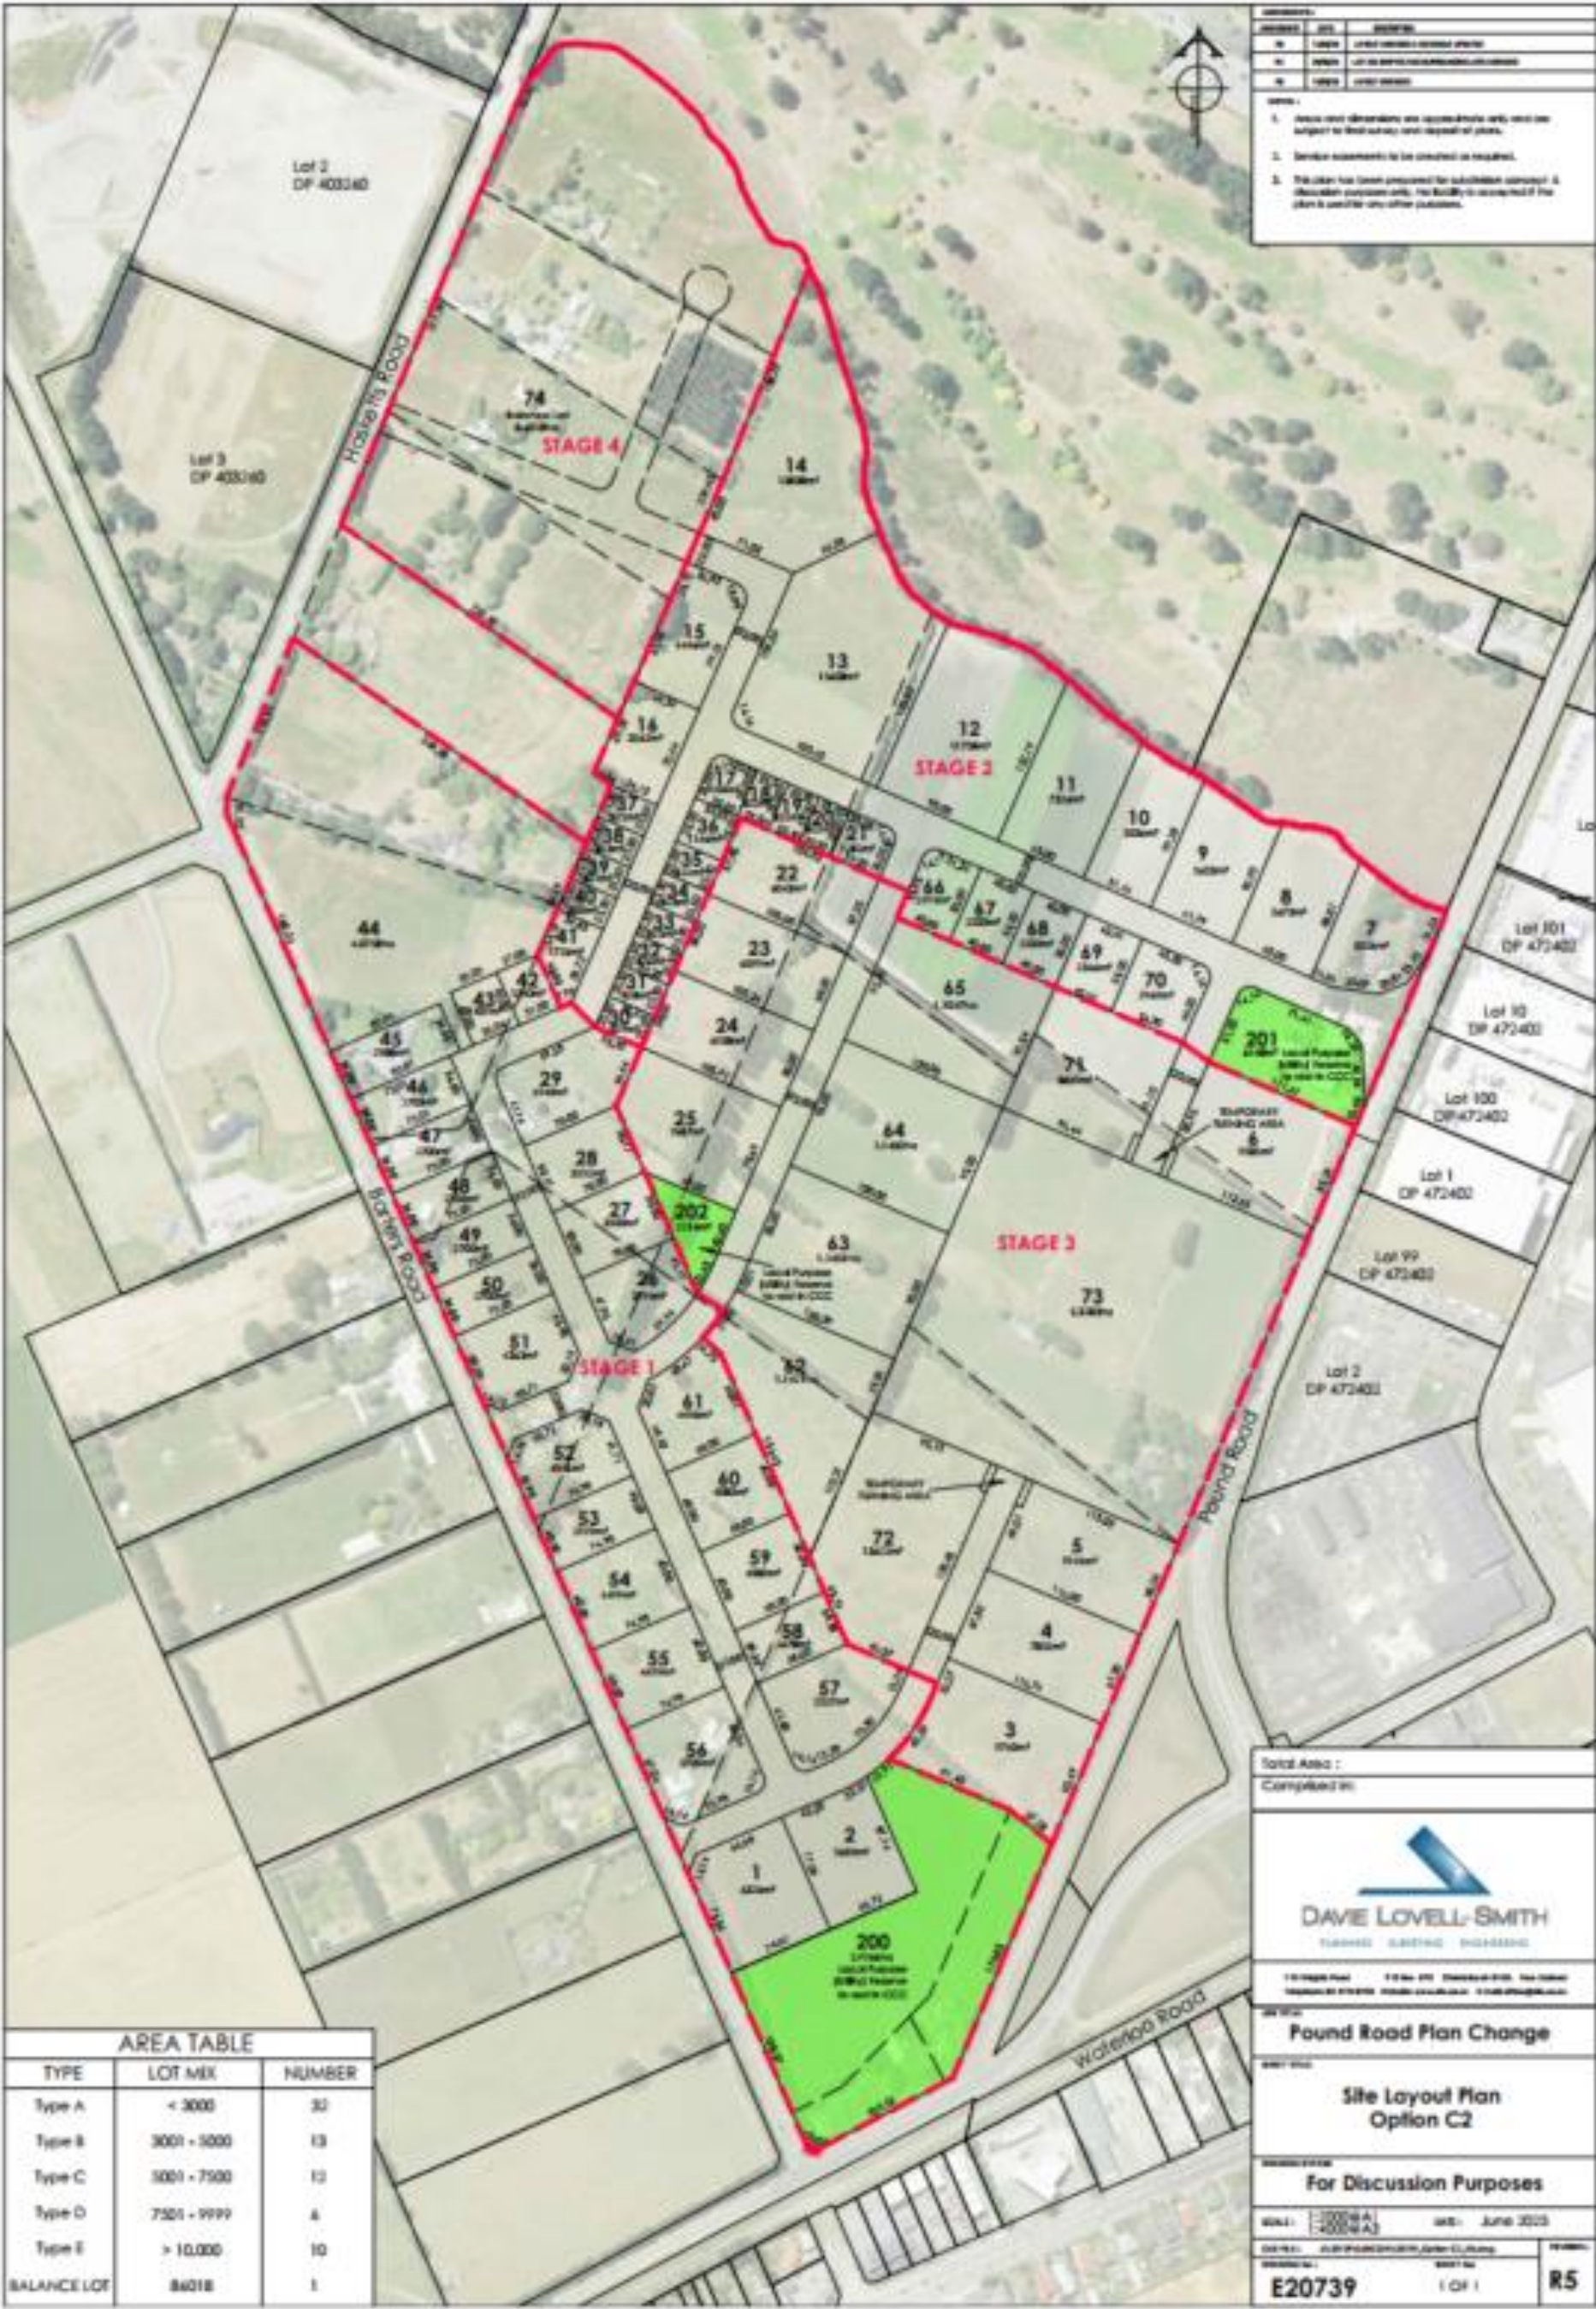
Proposed industrial development plan for Pound Road, Templeton, Christchurch. Figure provided by Davie Lovell-Smith, 2025.
